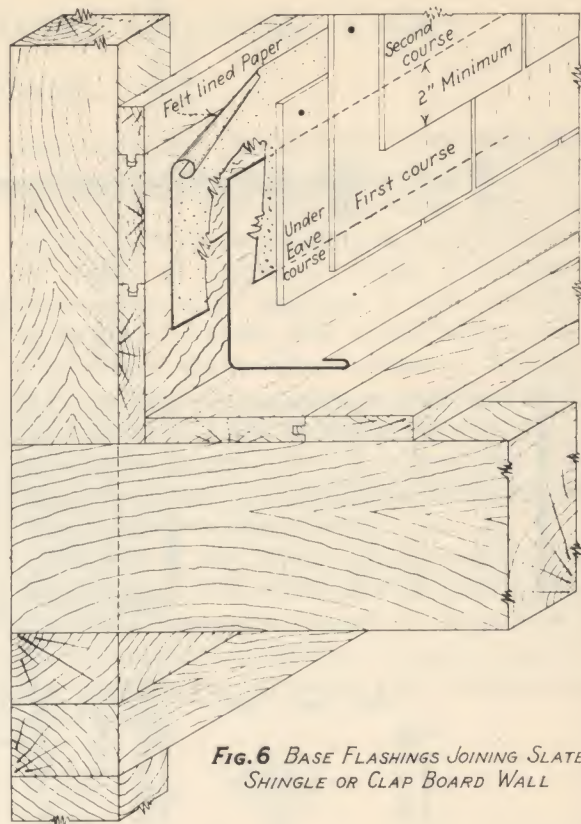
BASE FLASHINGS JOINING SLATE, SHINGLE OR CLAP BOARD WALL
